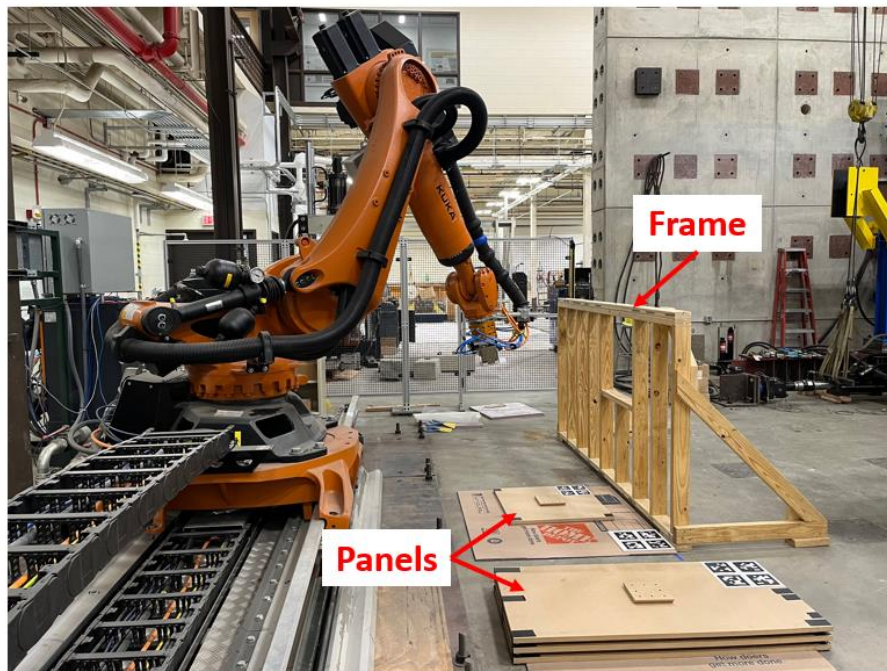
Wall Frame and Drywall Panels used in Case Study
